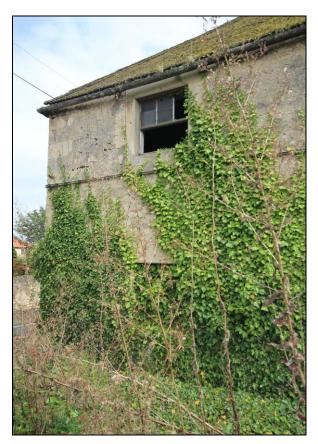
View of the northern portion of the west elevation of building L with apertures hidden beneath vegetation.
